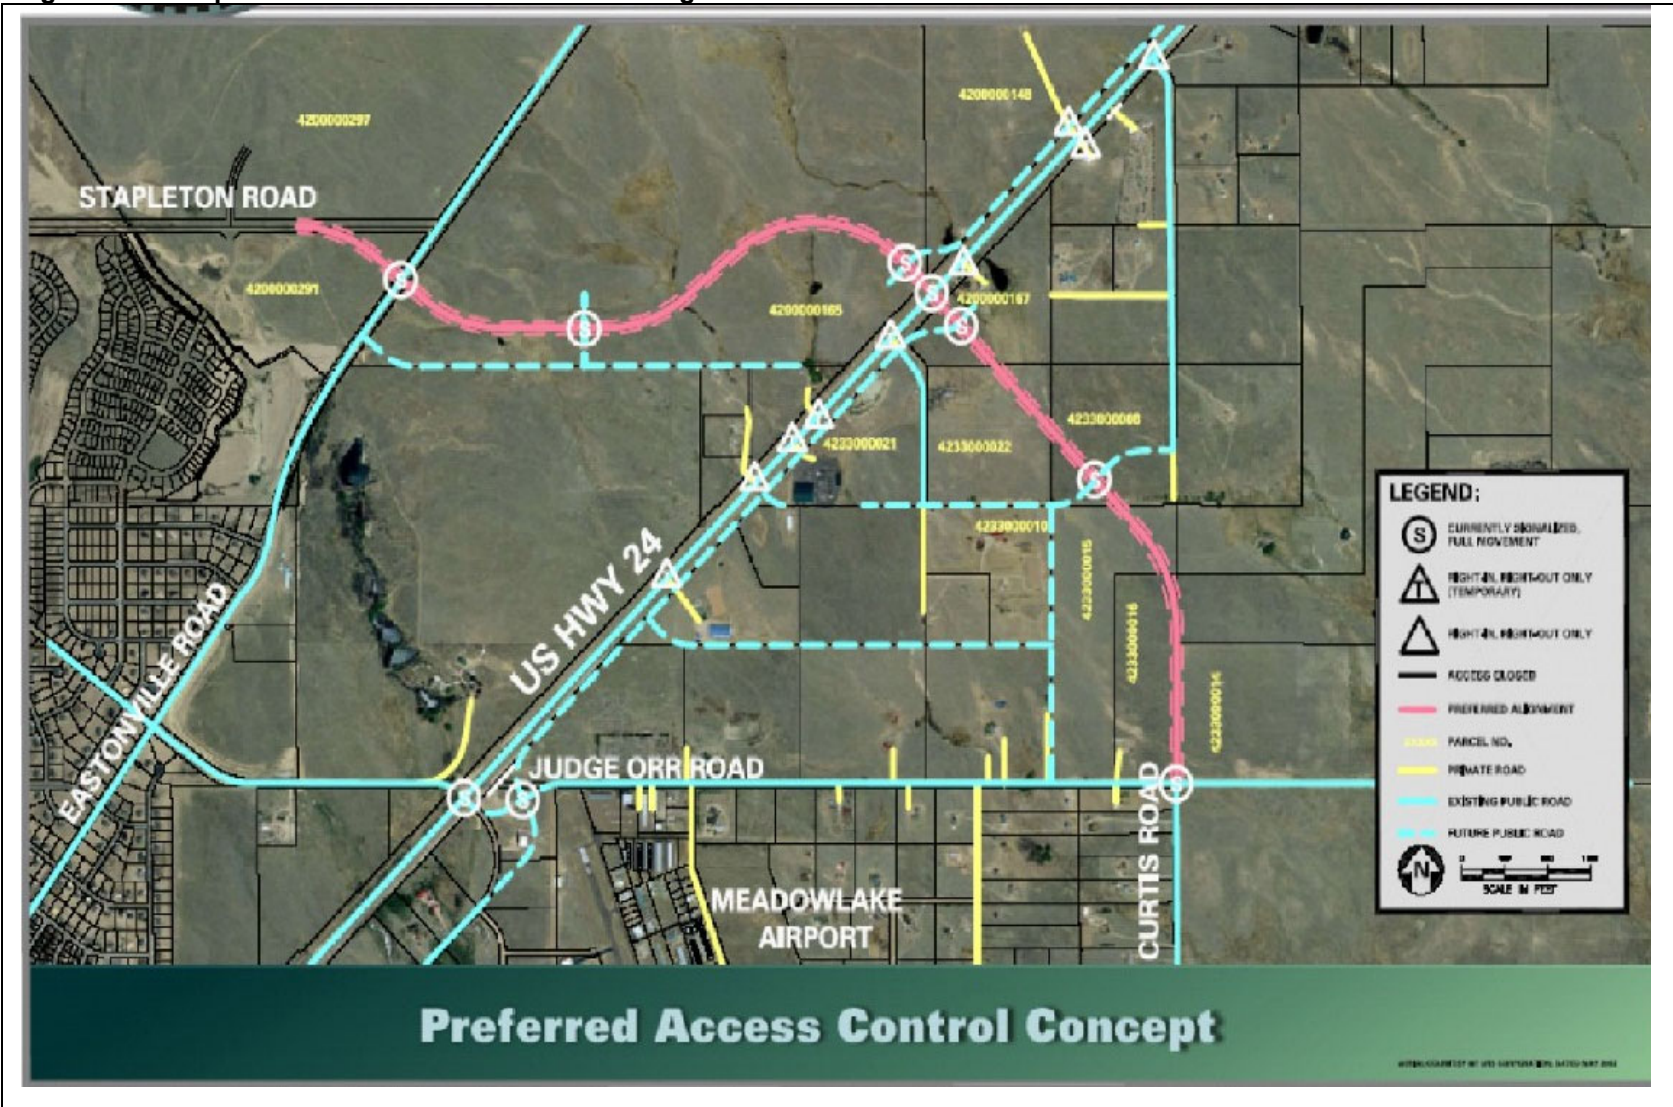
U.S. 24 Access Management Plan Maps – Falcon Highway to South Bluegill Road
